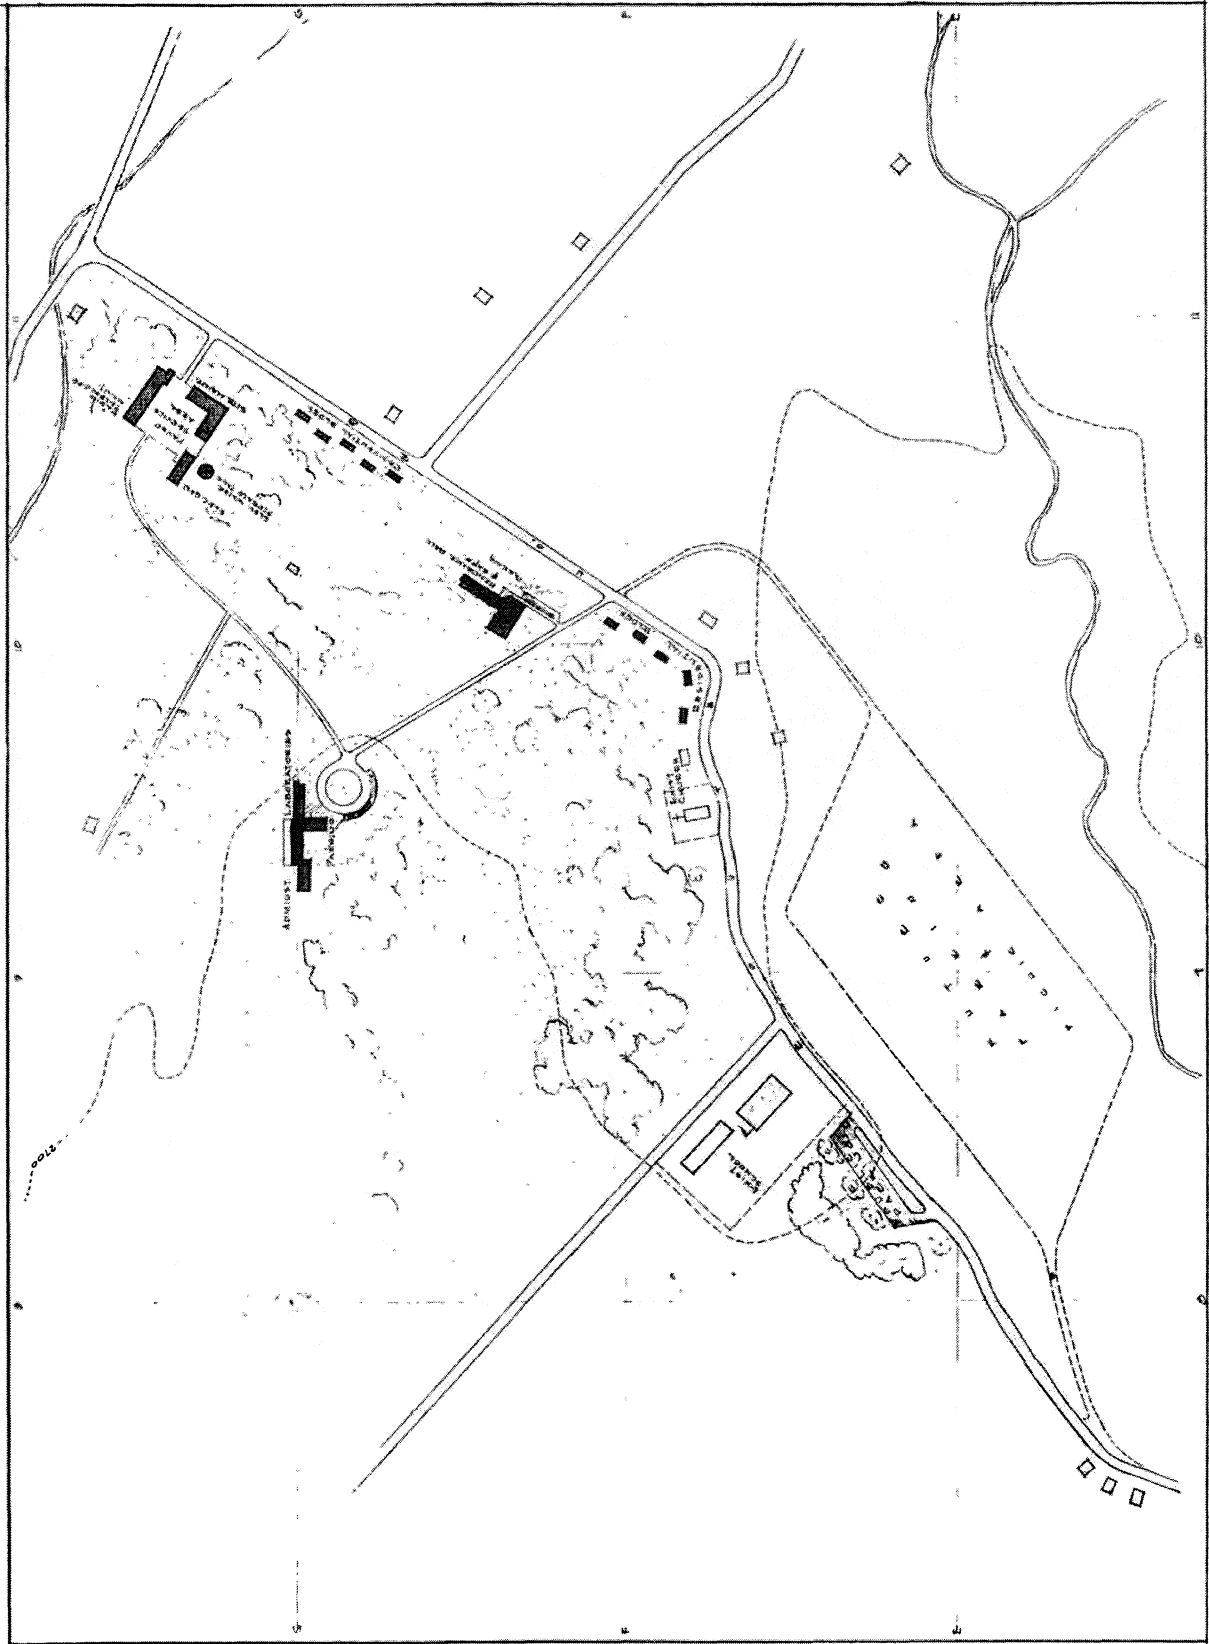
Detailed Site Development for a portion of the area that would contain the Central Laboratory Building and other proposed structures such as Residential Buildings, Main Buildings and Individual Residences, as Prepared by Eggers & Higgins Architects of New York City.
